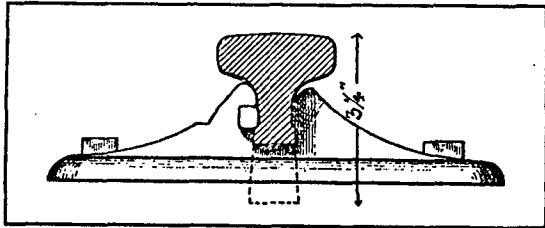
Rolled iron edge rail, made in 15-foot sections and supported at joint by cast iron chairs.
